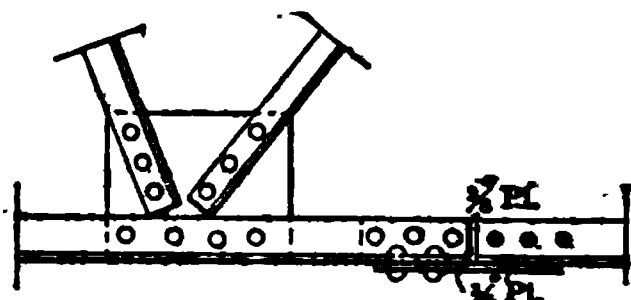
Detail of Joint E and Splice in EH, Fink Truss, Fig. 7
